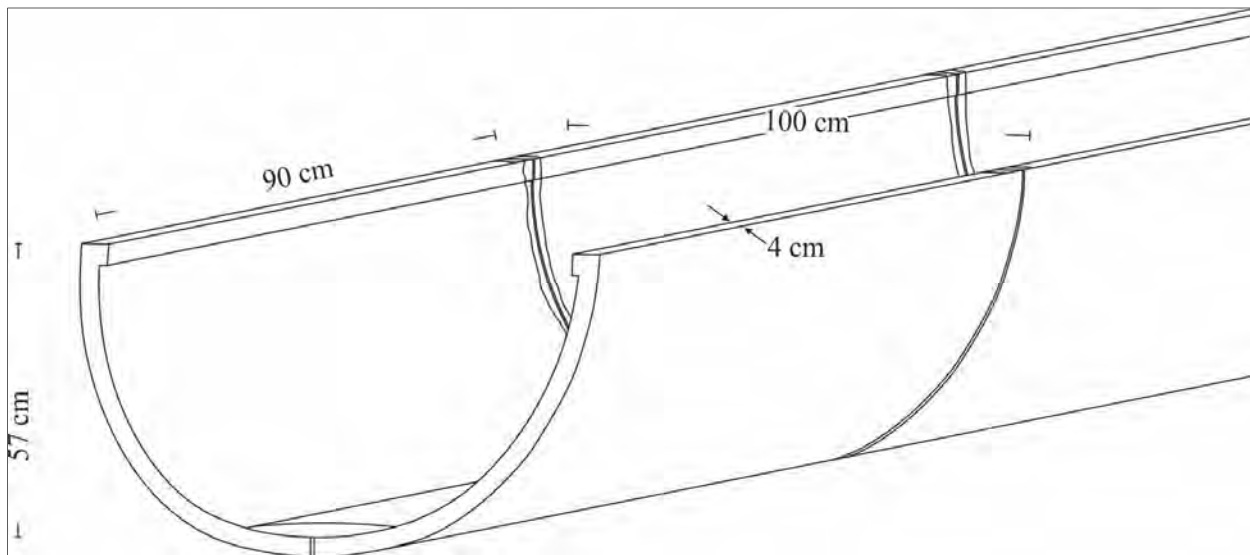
Schematic drawing of Site 7716 concrete irrigation ditch showing segmented construction.
